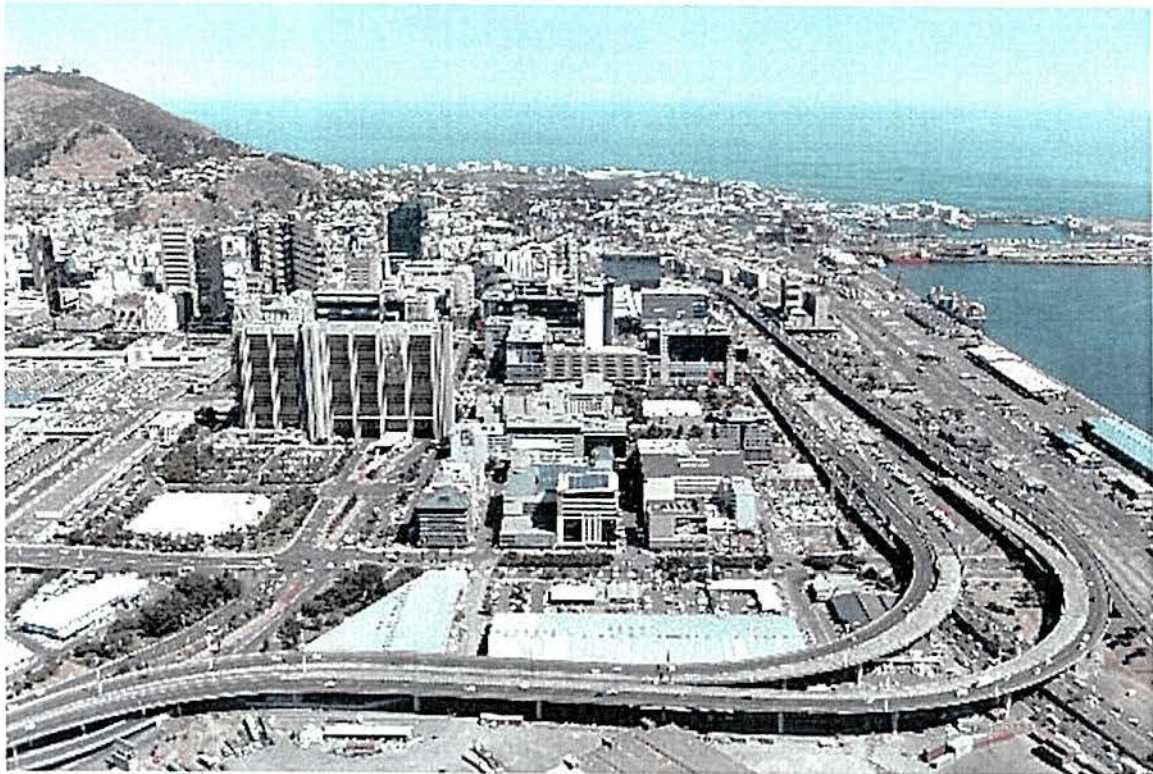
Foreshore Freeways consists of 9 km of Roadway Bridge, it is located at the edge of Duncan Docks less than 500m away from the harbour and links the Nelson Mandela Freeway to the edge of the CBD of Cape Town. (Bruce Sutherland, 2009)
